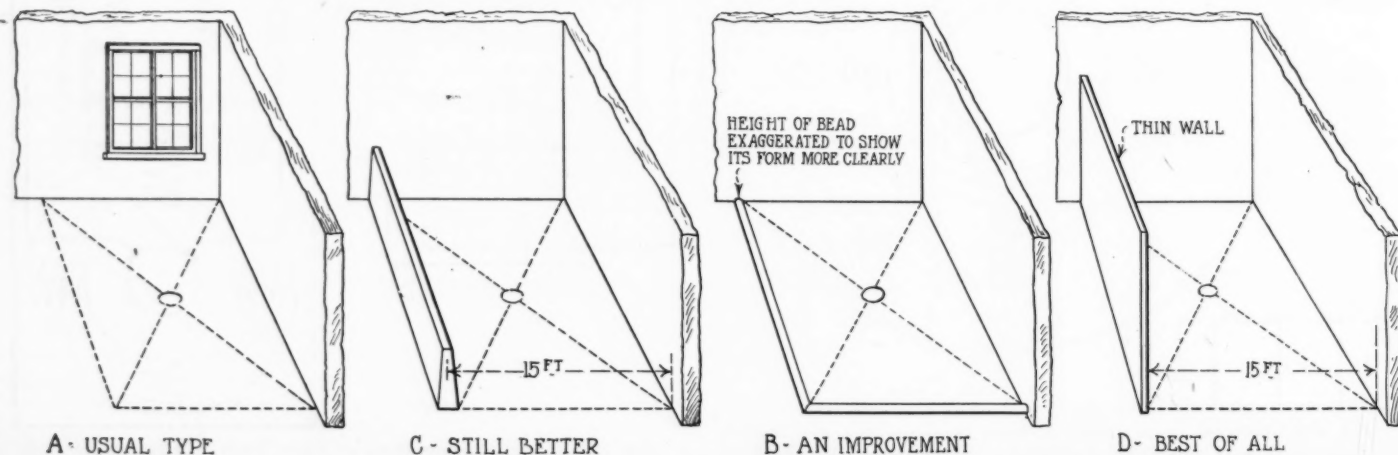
Four ways of arranging washrack in a corner of the garage, showing the best
